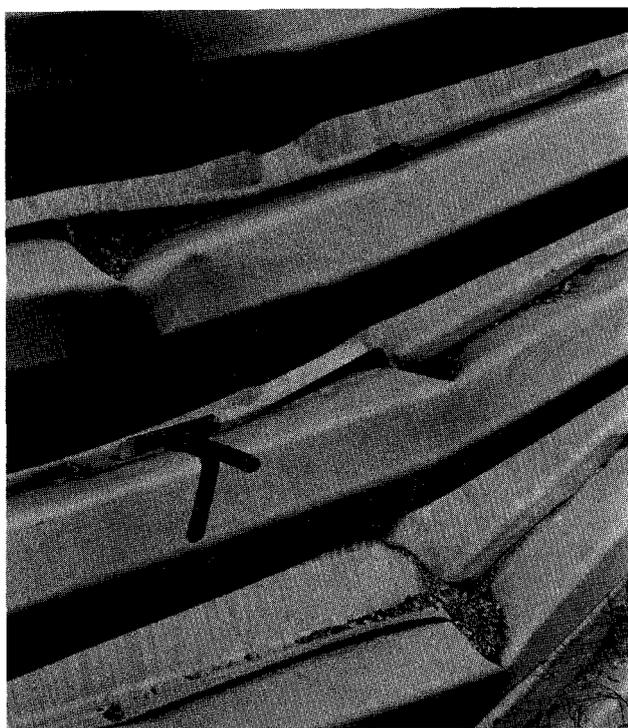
Distress in Armco bin retaining wall. Notice the tears in the sheet metal, the sheared bolts and the piping gravel. Geologic hammer is for scale.
